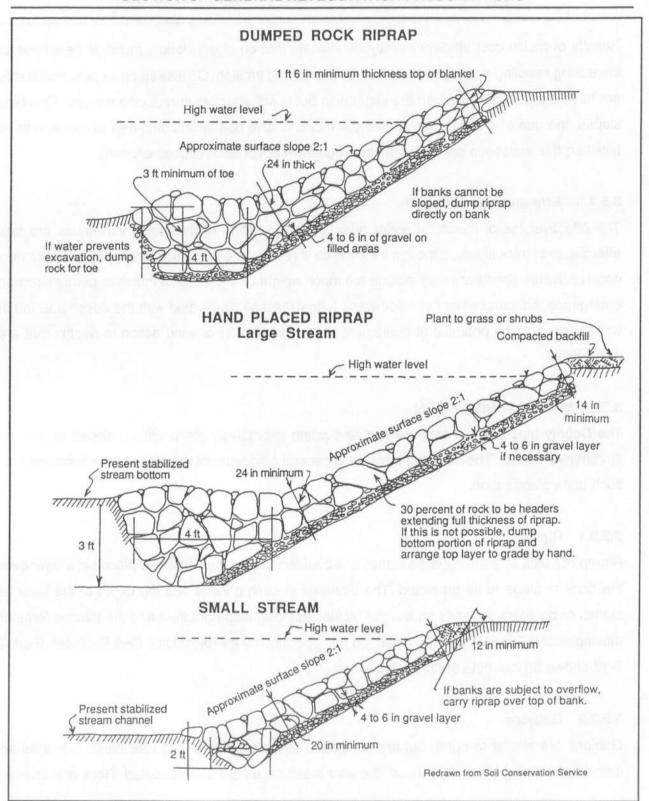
Design and Construction of Riprap Slope Protection.
